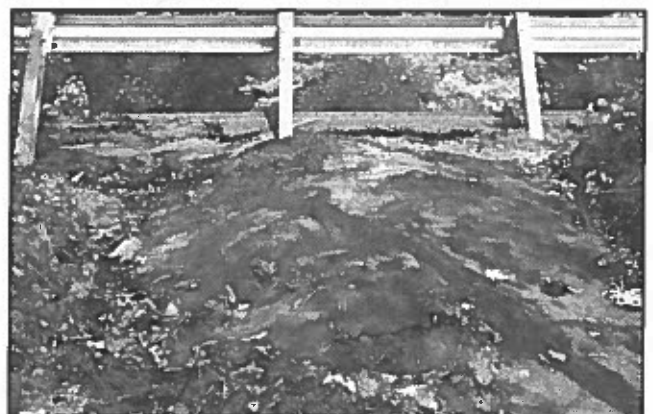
Excessive asphalt used to stabilize a failing fill bank on Route 7
